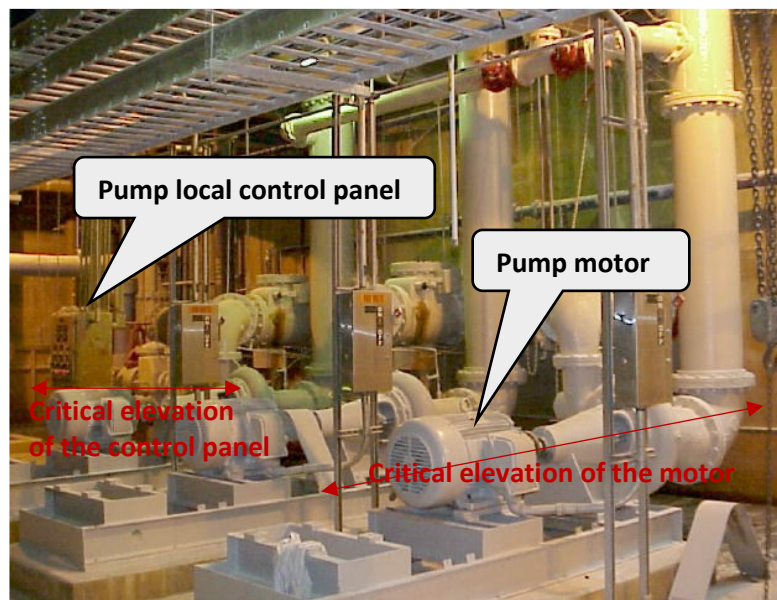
Critical elevation of East Secondary Waste Sludge Pump (DCWASA, n.d.-e)
